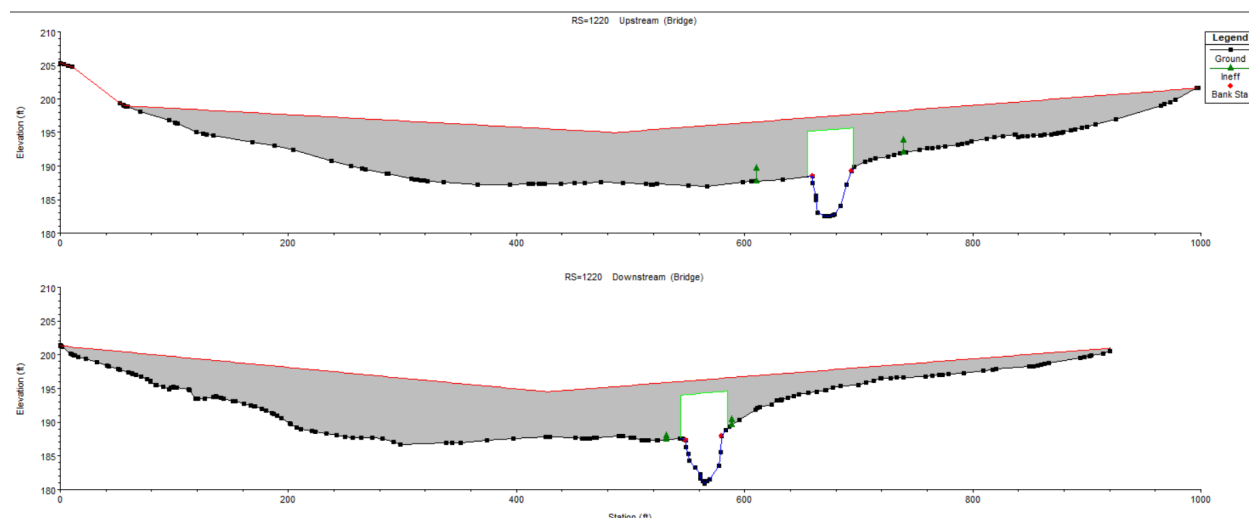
Bridge Model Profile View with Adjusted Stream Bed to Lower Water Surface Elevation
